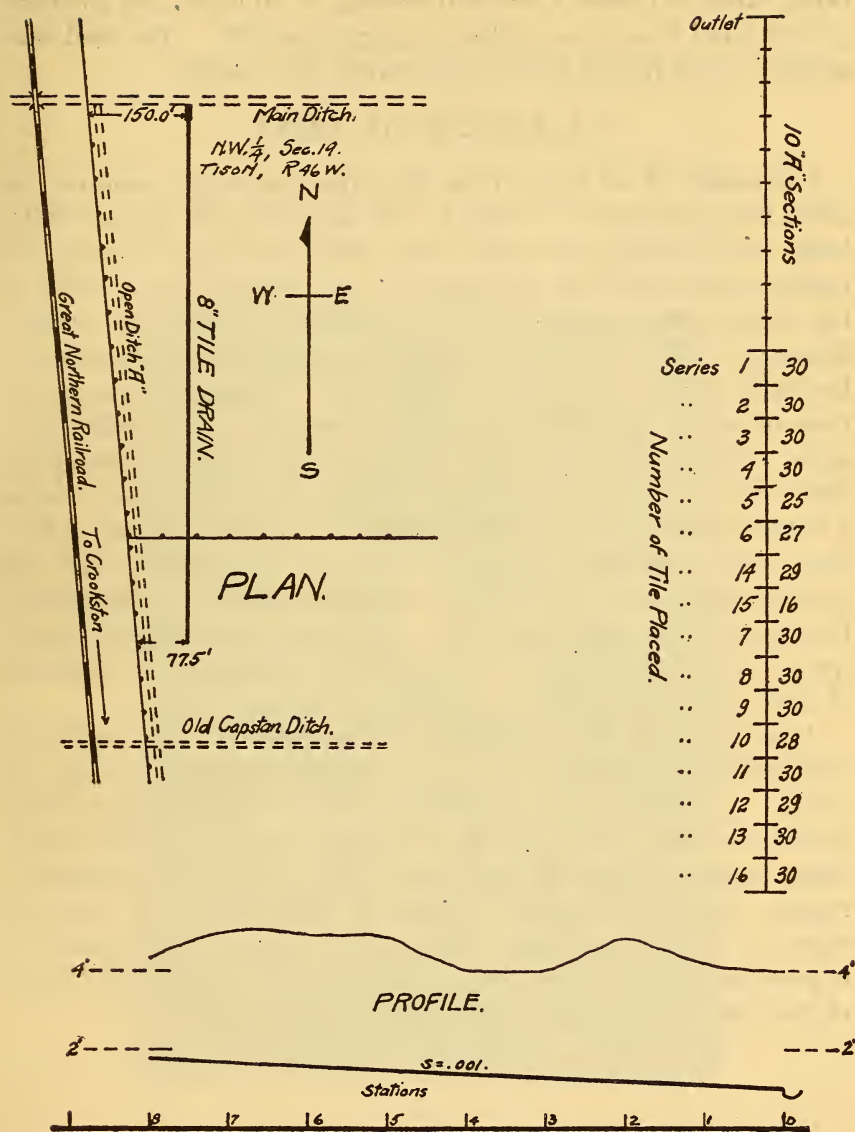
Showing location, plan, profile, and arrangement of experimental drain tile at Crookston, Minn.
